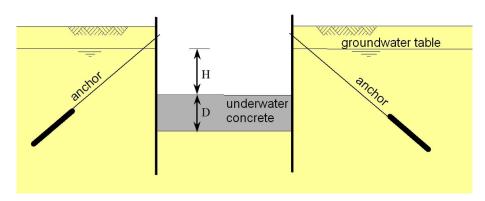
Cofferdam with unanchored concrete slab (gravity slab)
